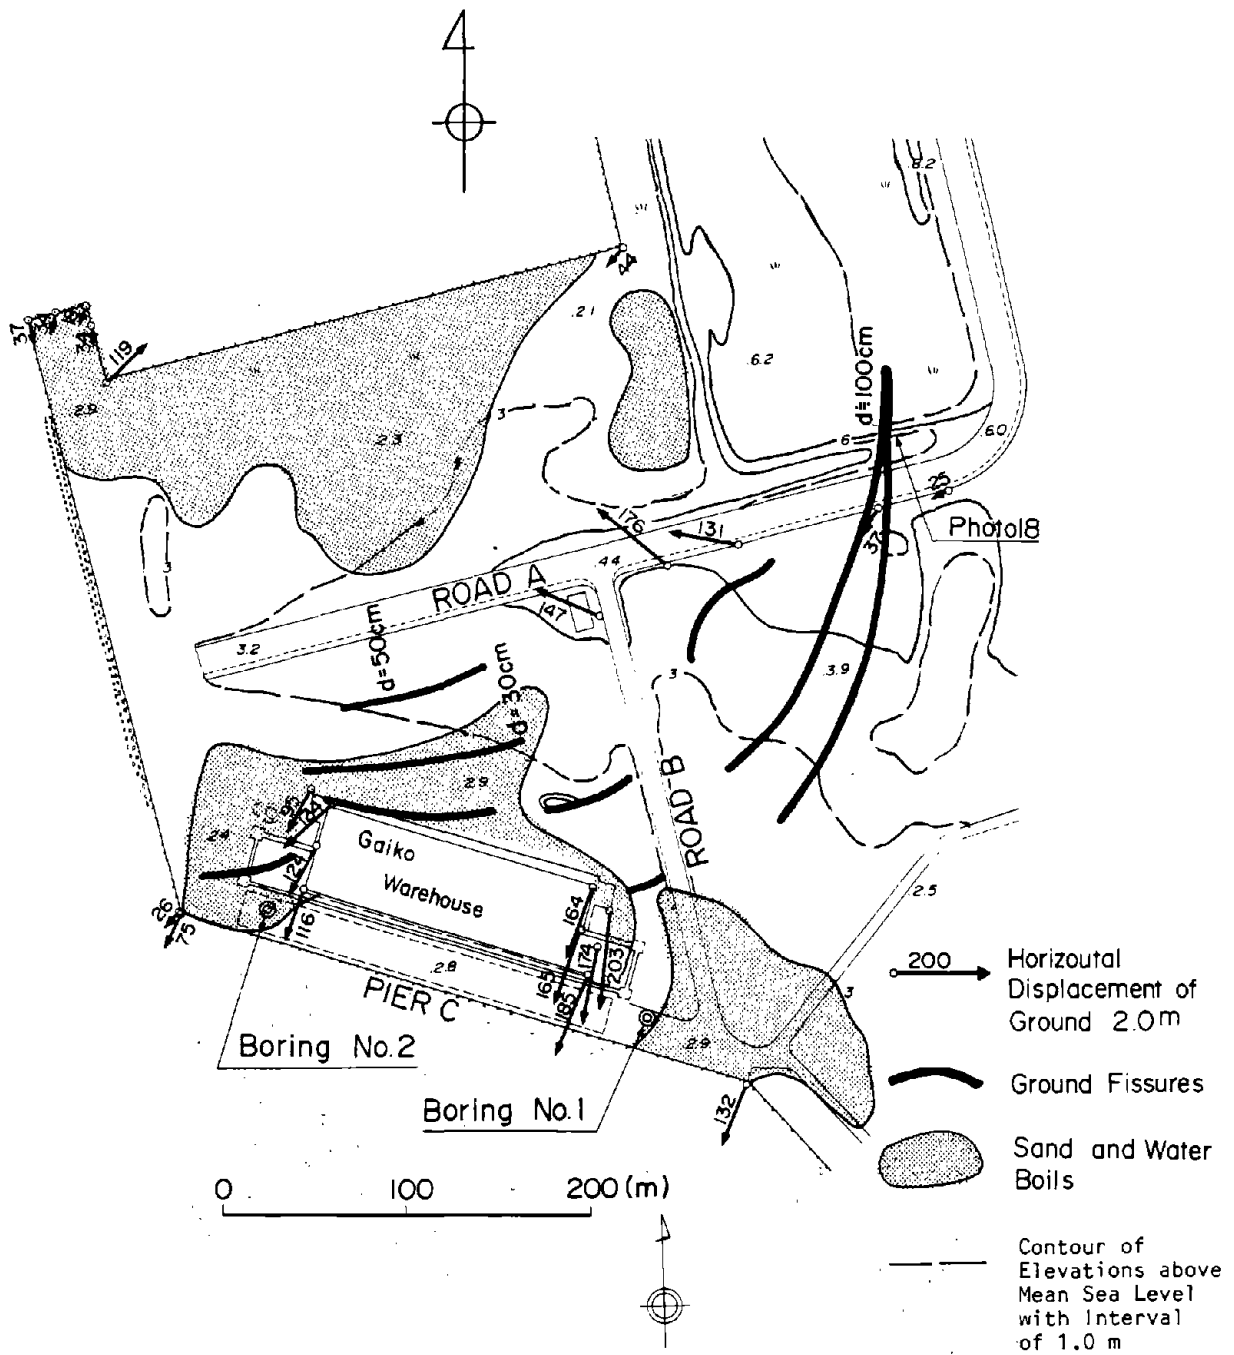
Permanent Ground Displacements, Ground Fissures and Sand Boil at Gaiko Wharf
